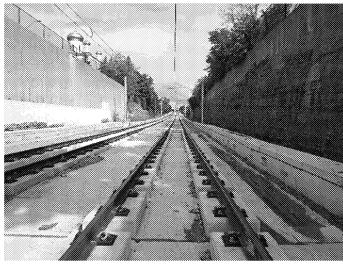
(left): West bound track, looking facing traffic, from Bay View towards Pimisi
